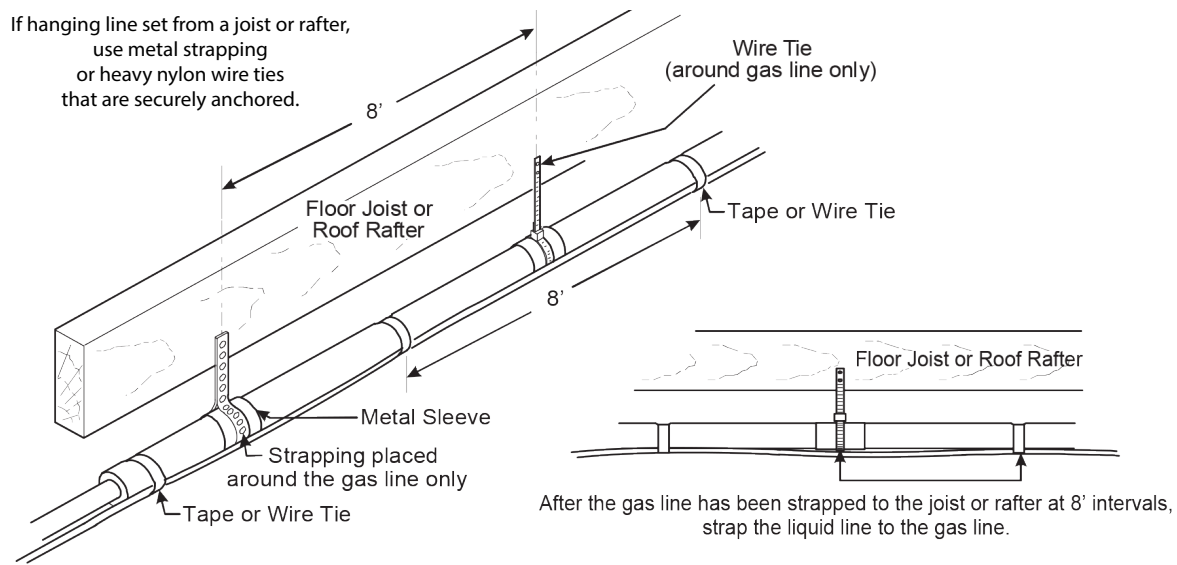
Installation of Refrigerant Piping (Horizontal)
